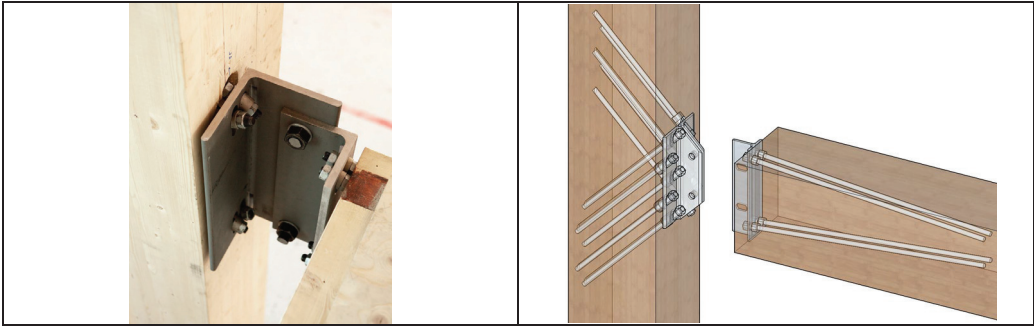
Picture of the connector installed between the floor element and the column (left) and principle of the connector showing the threaded rods (right).
